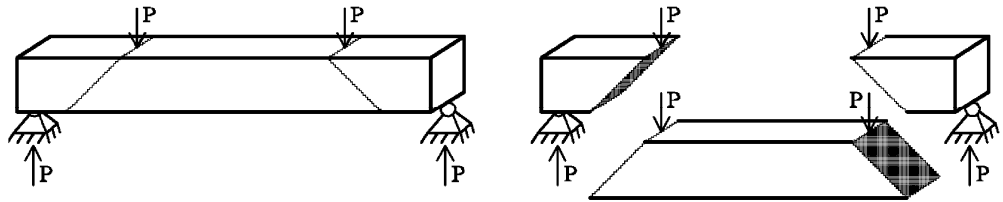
Damage at failure in series of tests on beams without transverse reinforcement. (After Leonhardt, 1962.)
